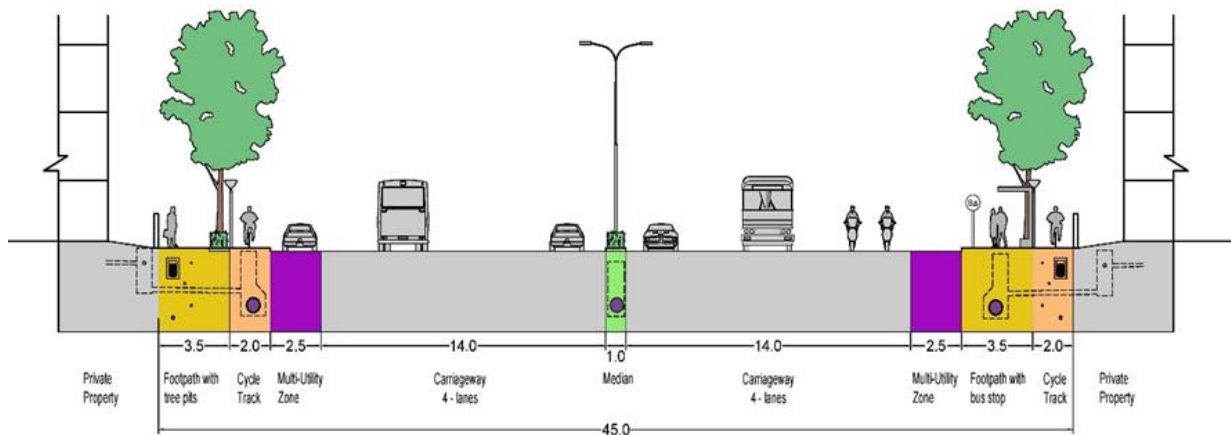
TYPICAL SECTION OF 45M WIDE ROAD
